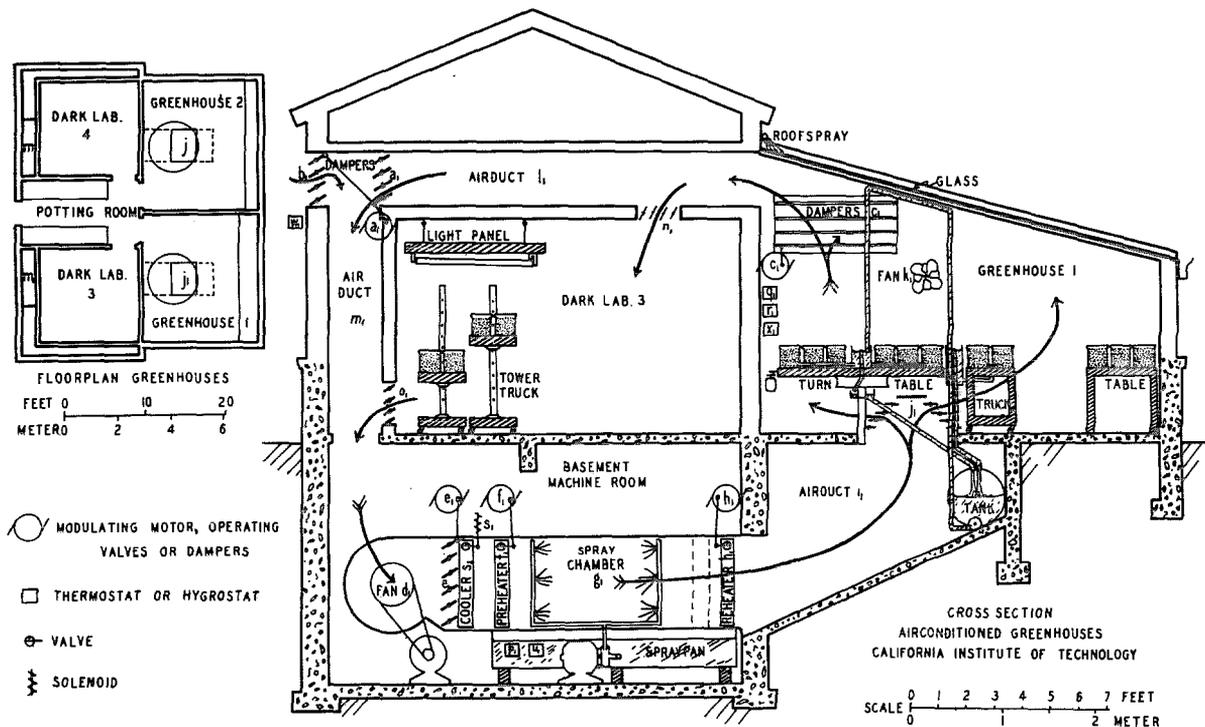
Floor plan of the greenhouses (left side faces north) and cross median section through house "1" and room "3."
